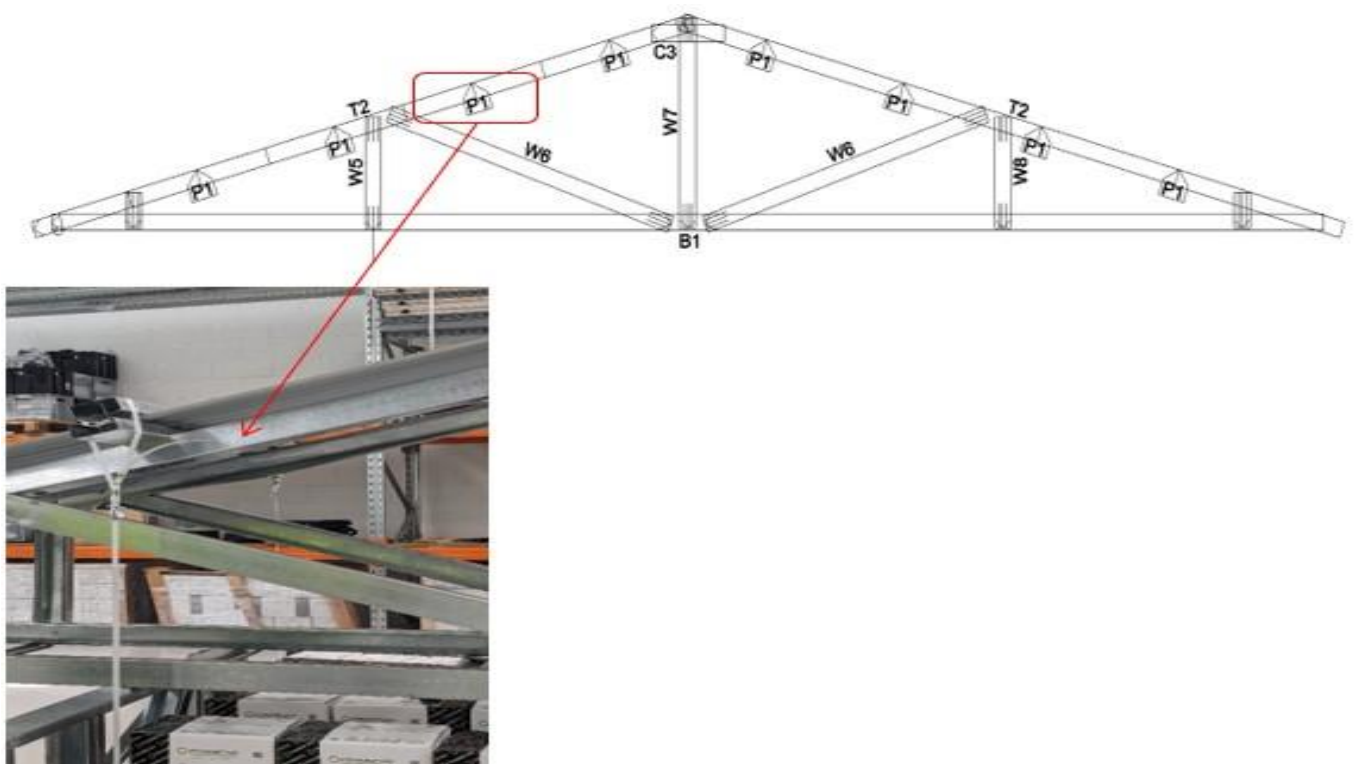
Outward distortional and local buckling failure on Truss 2 of Test 1
